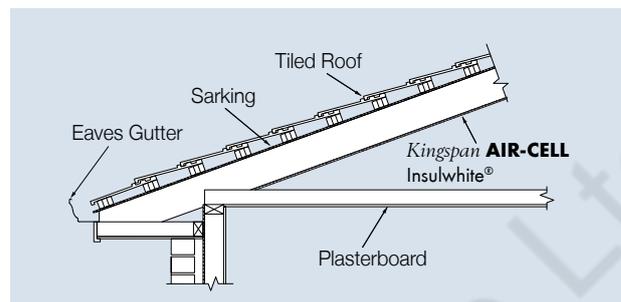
Side elevation of *Kingspan AIR-CELL Insulwhite®* in a pitched tiled roof retrofit (attic conversion)
